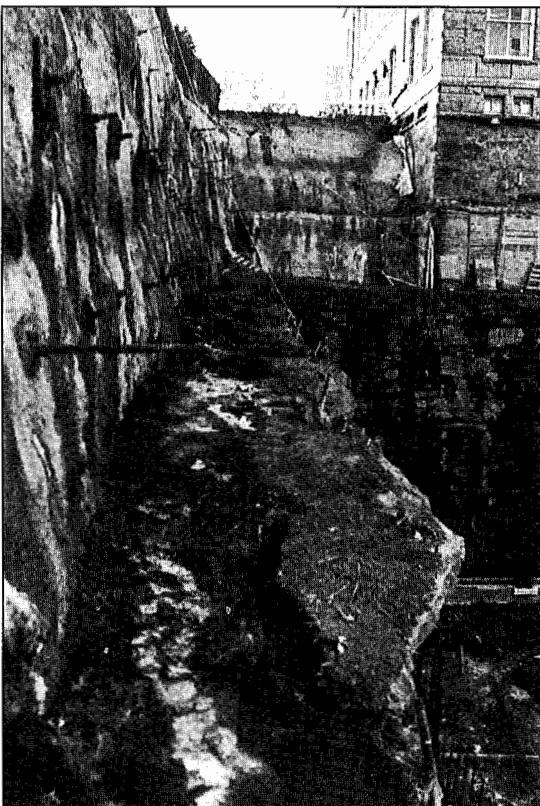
A photo of the opened "dip" joint that caused the block movement at the corner of the stairway area inside Stimpson Hall.
